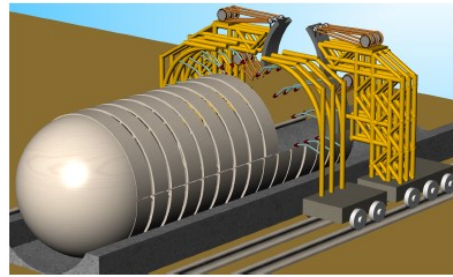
Rear view of arch-traveler with trailing carriage for concreting.
